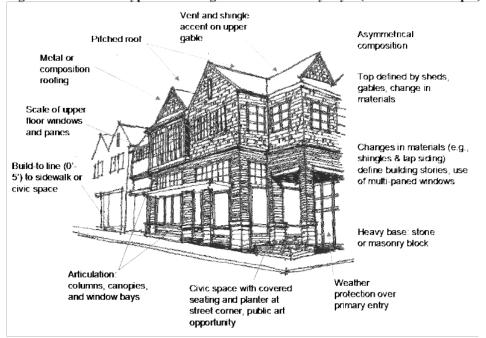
E: Typical Building Elements in Sandy Style (Mixed Use Example)
